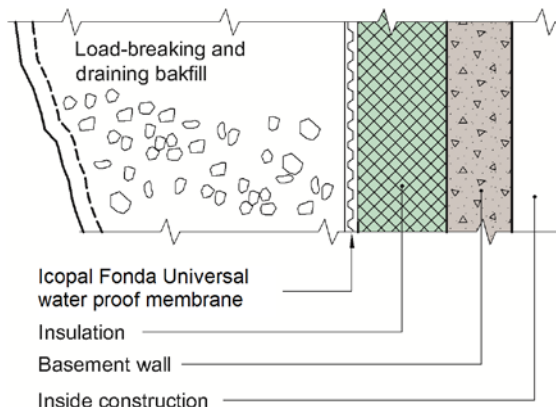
Icopal Fonda Universal used on insulated basement wall. For quicker dry out of the basement wall it is recommended to place the membrane outside the vapour open insulation as e.g. EPS, see also SINTEF Building Research Design Guide 523.111.
